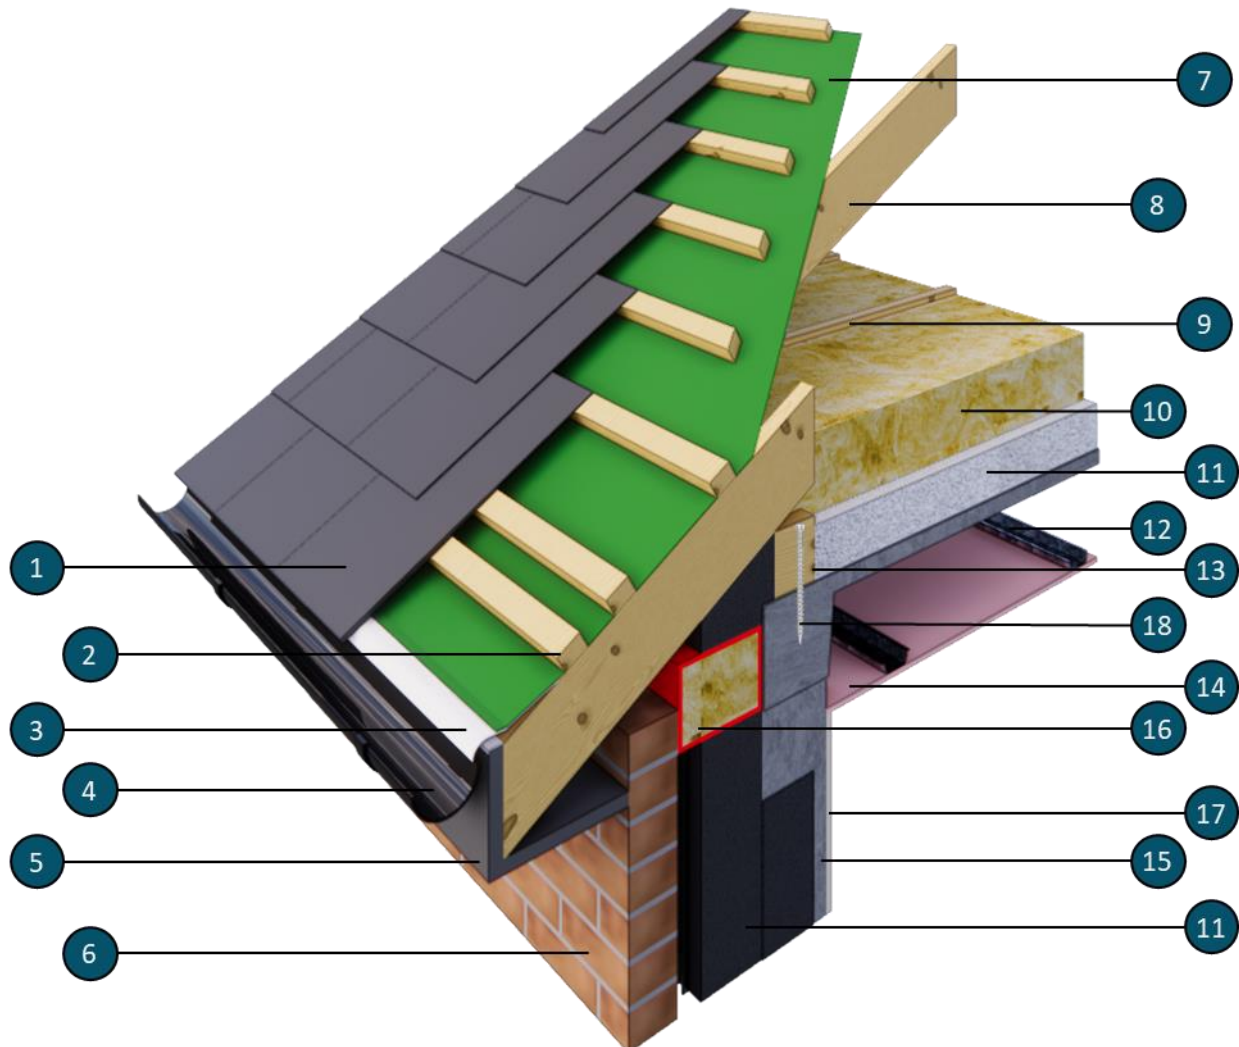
External wall with traditional brick/block outer leaf cladding to roof junction (non-habitable attic space)
